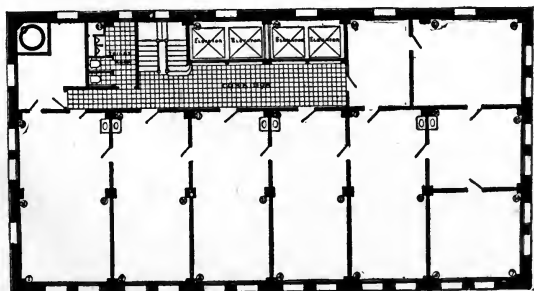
Broadway Chambers, New York City. Typical-floor Plan.
